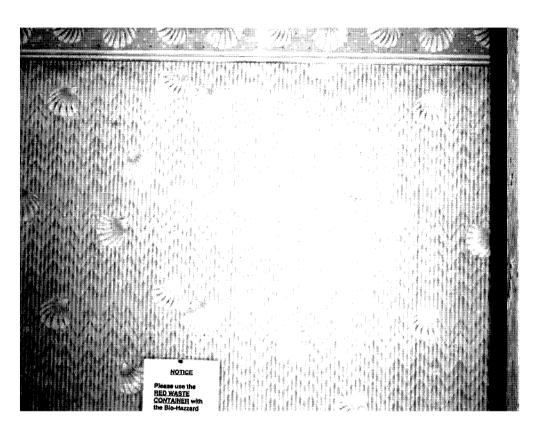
Seashell pattern vinyl wall covering, NE women's restroom, off central kitchenette area
